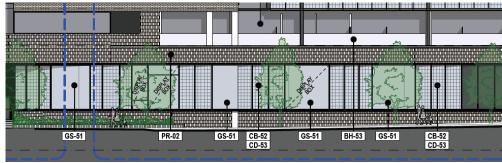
Previous approval - Heidelberg Road Elevation with combination of glass bricks, clear bricks and display cabinets above a brick plinth
